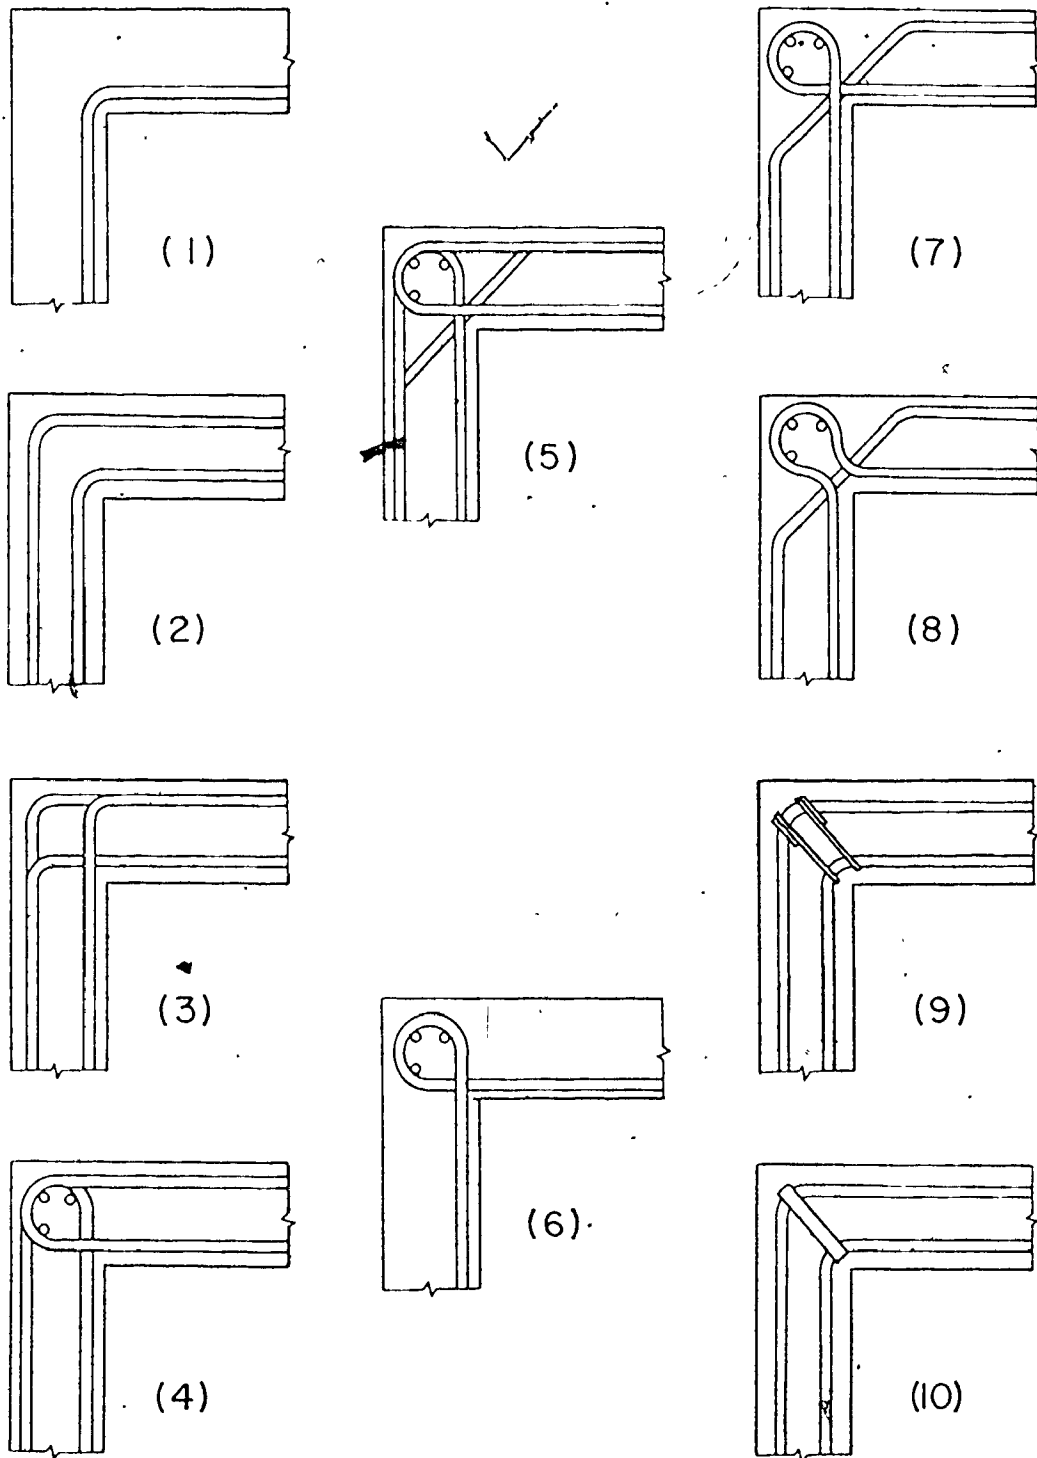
DETAILS OF CORNER CONNECTION REINFORCEMENT
